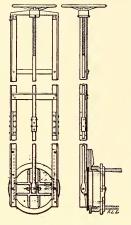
Outlet gate for small embankment, showing connection for vitrified pipe.
